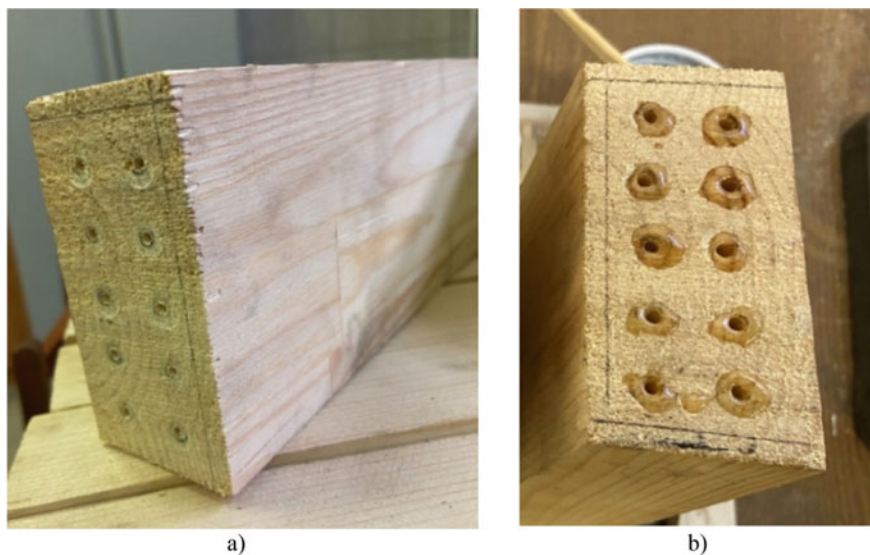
a Manufactured wooden element with drilled holes (samples № 1–3); b Manufactured wooden element with drilled holes filled with glue (samples № 4–15)
